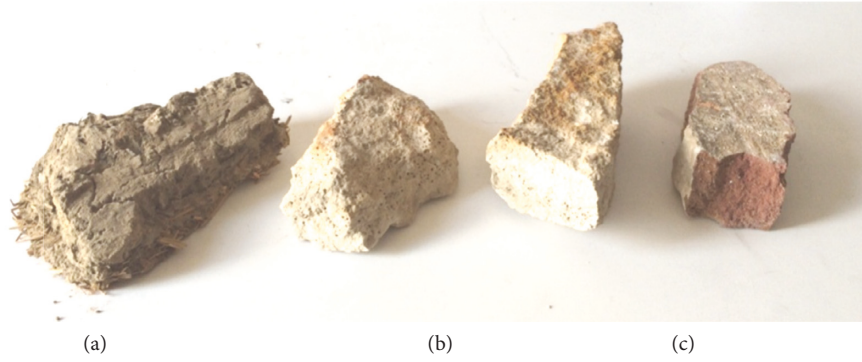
The masonry infill materials of the studied houses. (a) Adobe. (b) Stone. (c) Brick.
